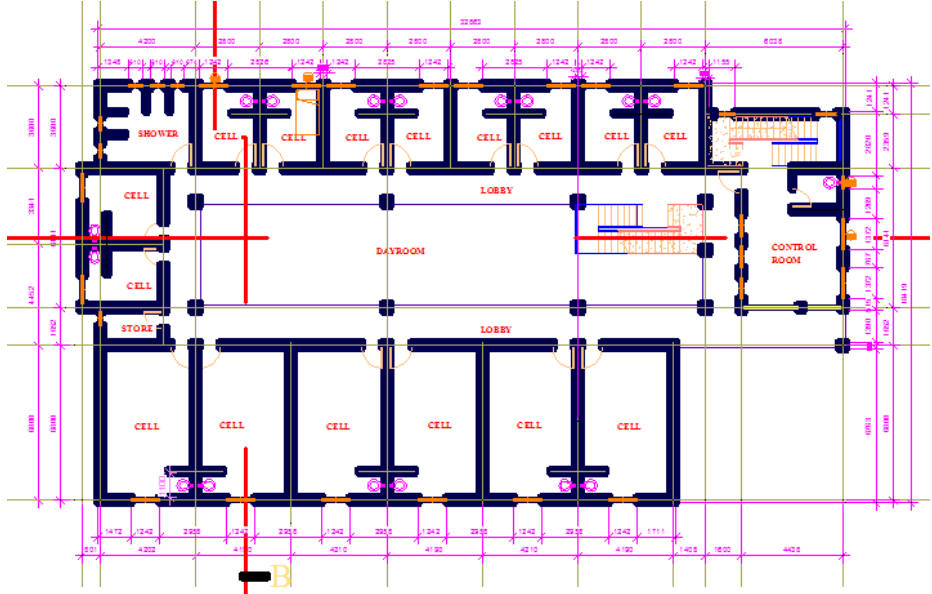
Proposed ground floor plan for minimum security cells/juveniles
